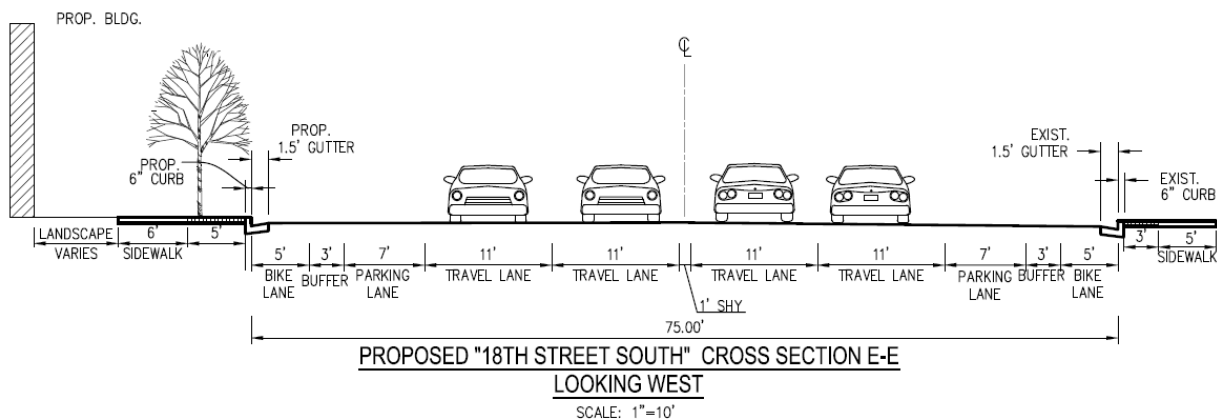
Proposed 18th Street South Cross-Section (Crystal House 6)
